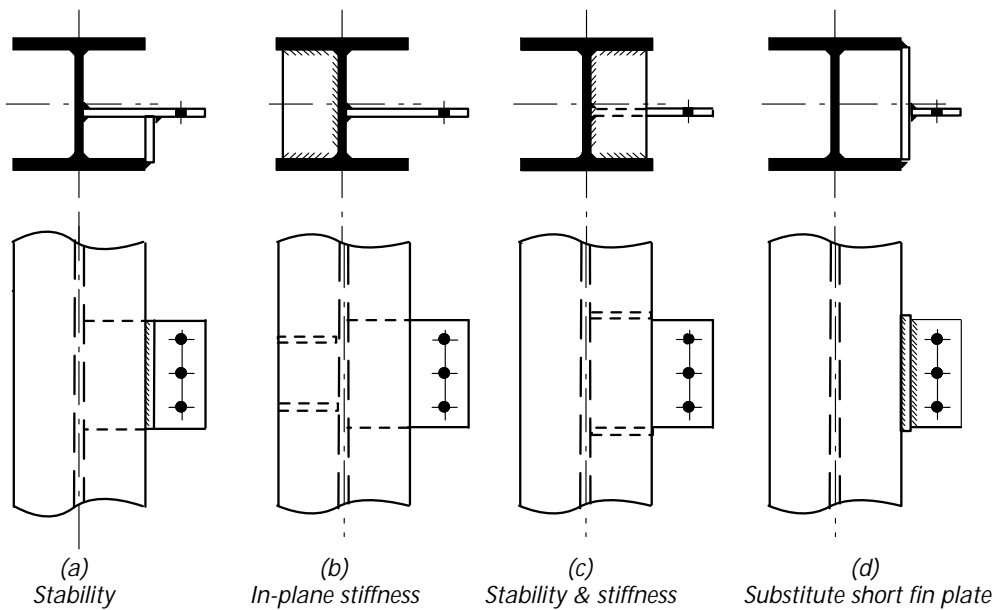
Stiffening arrangements for long fin plates to column webs
